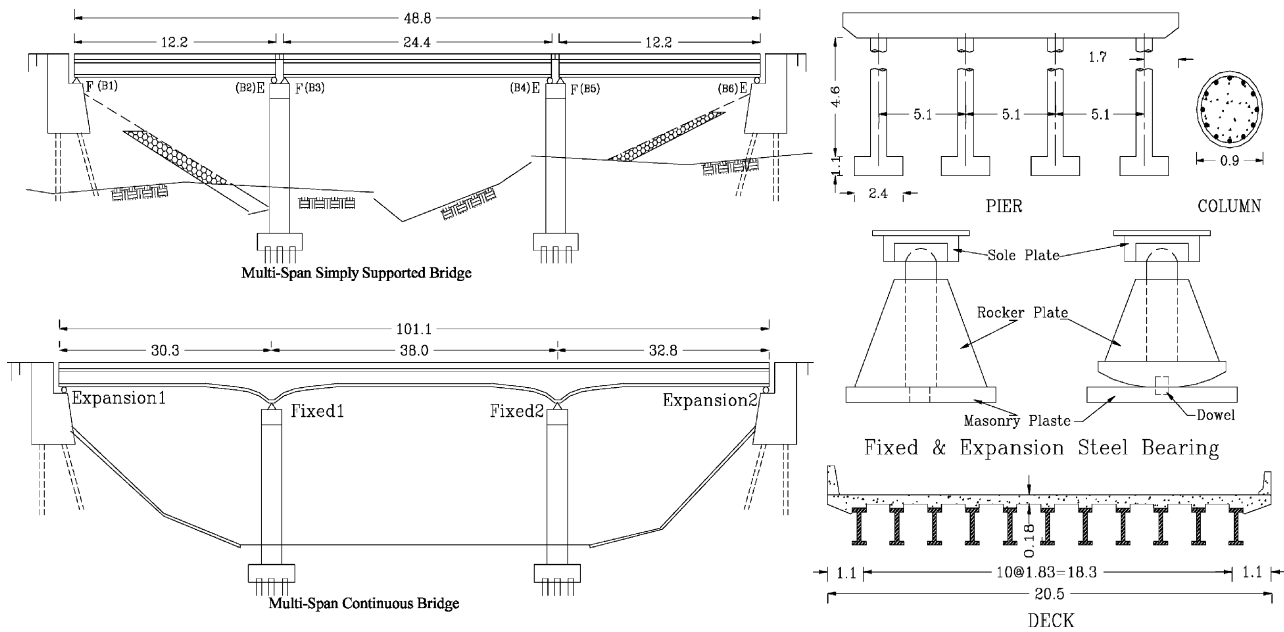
Typical multi-span simply supported and multi-span continuous steel girder bridge in the Central and Southeastern United States.
